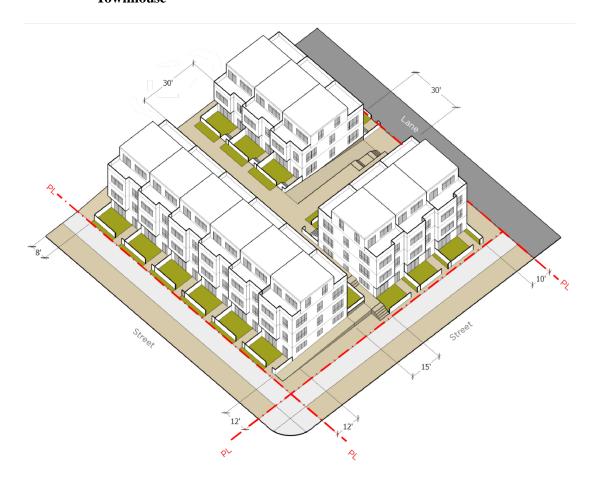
Corner site – Example Courtyard Rowhouse or (Courtyard) Stacked Townhouse
